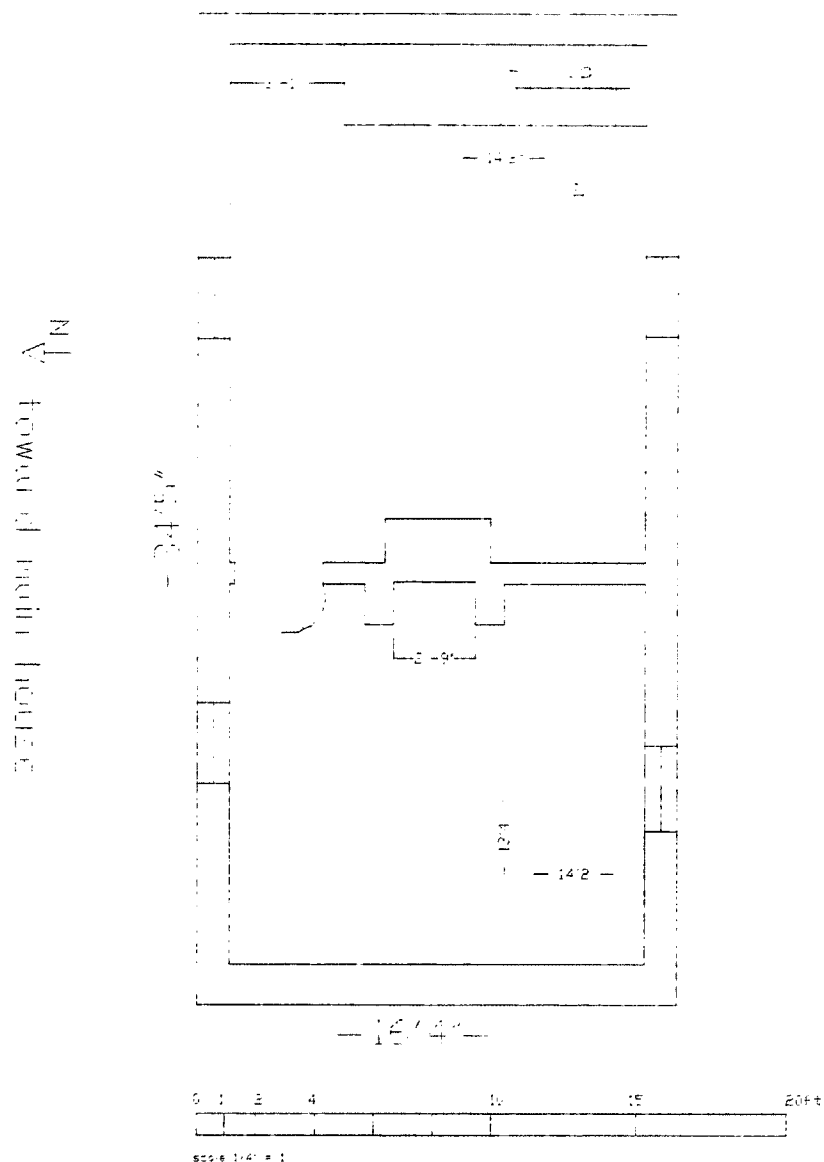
Floorplan, second floor of kitchen building at The Pillars, Bolivar, Hardeman County.
